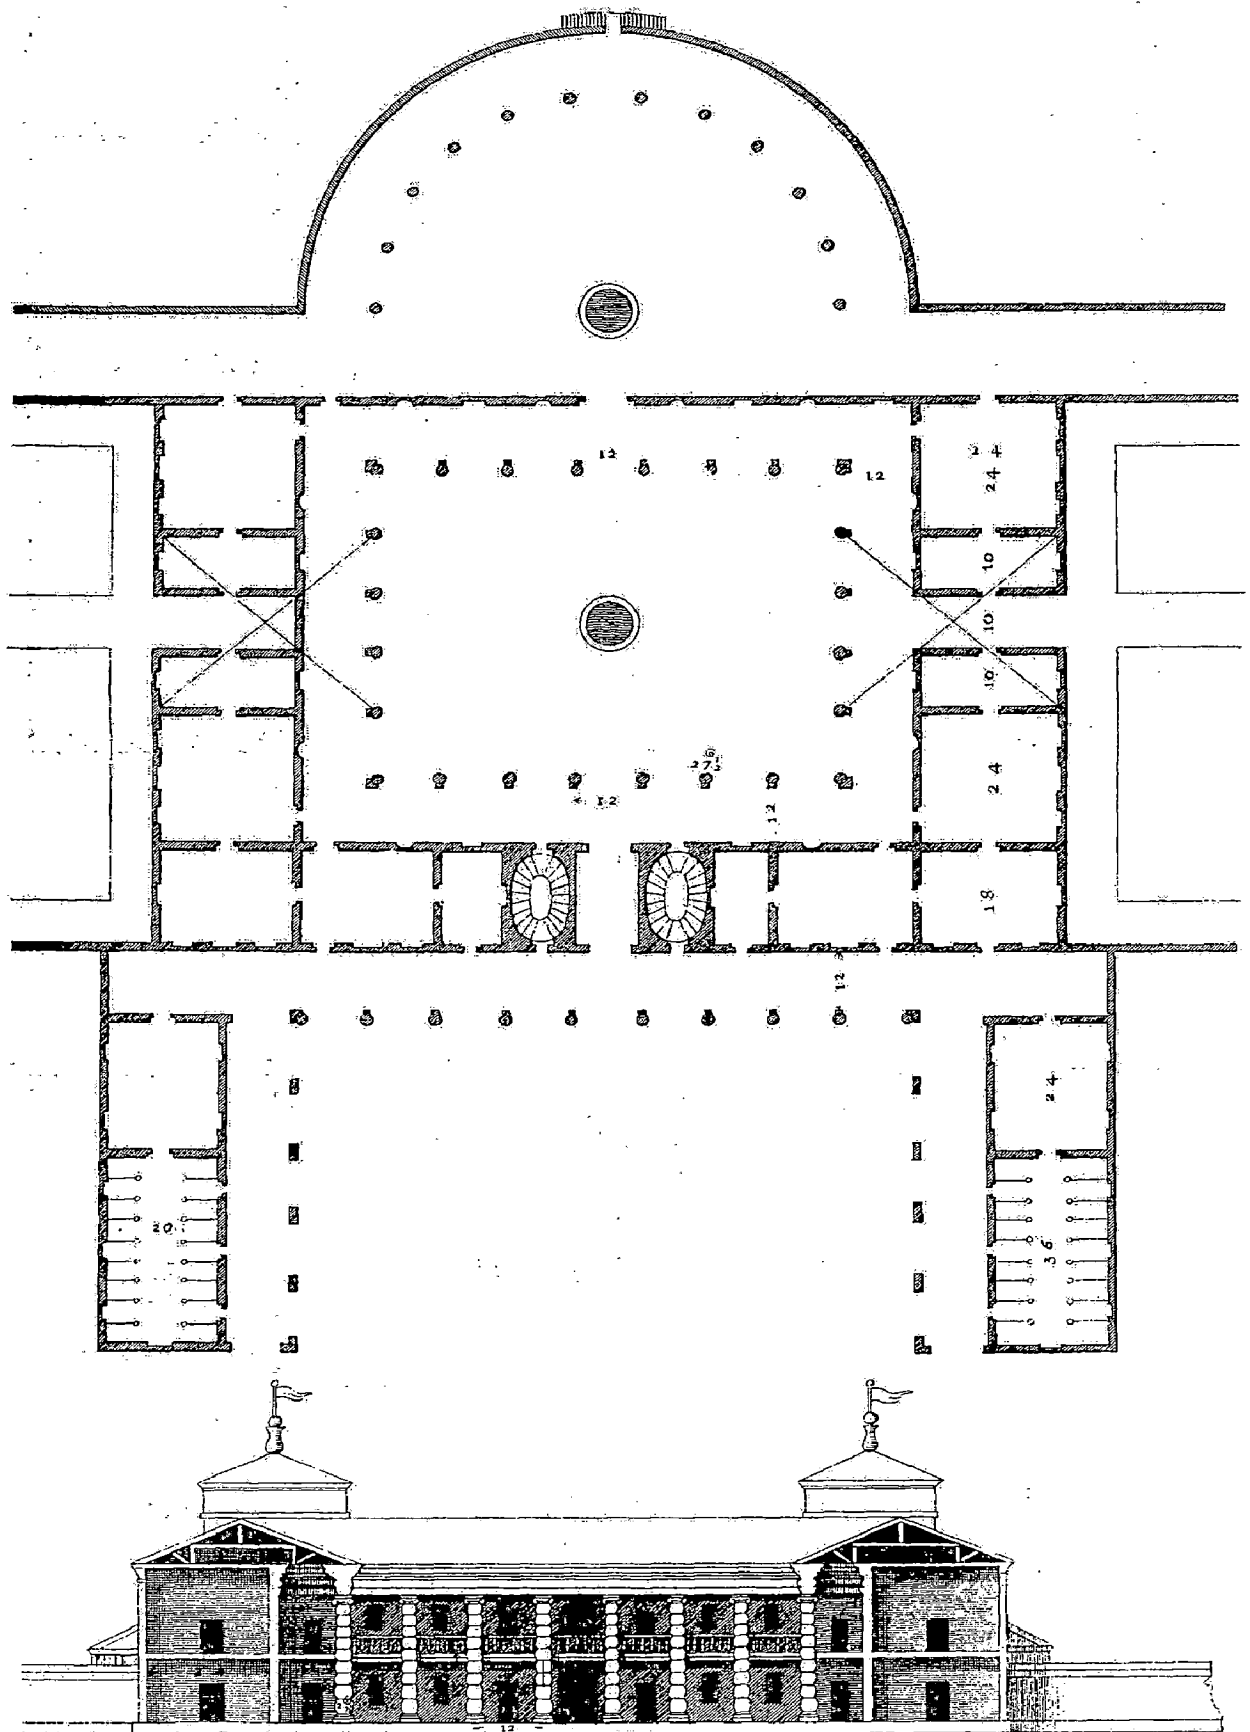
Villa Marc' Antonio Sarego at Santa Sofia in plan and sectional elevation
